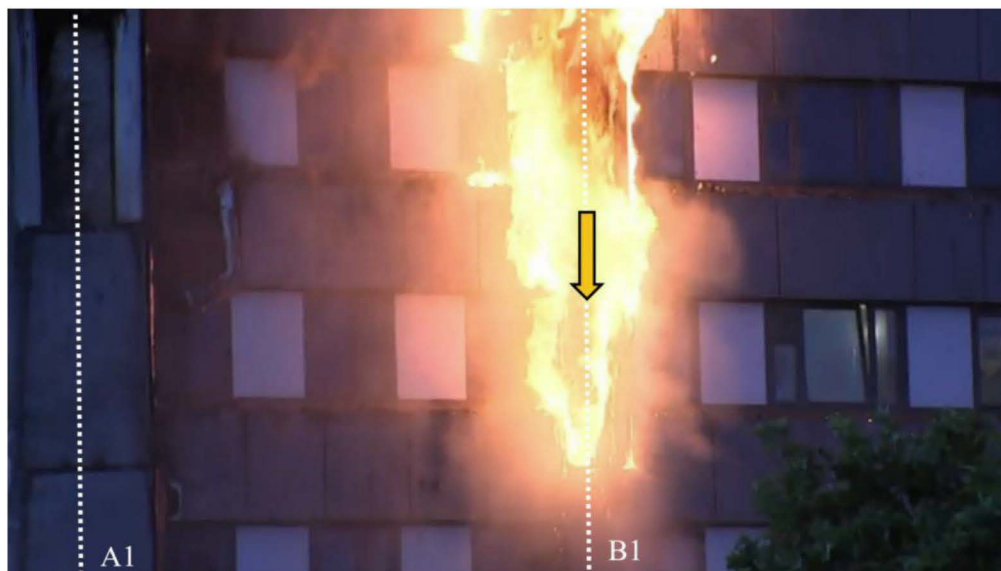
Downwards fire spread along column B1 on the West elevation⁴
